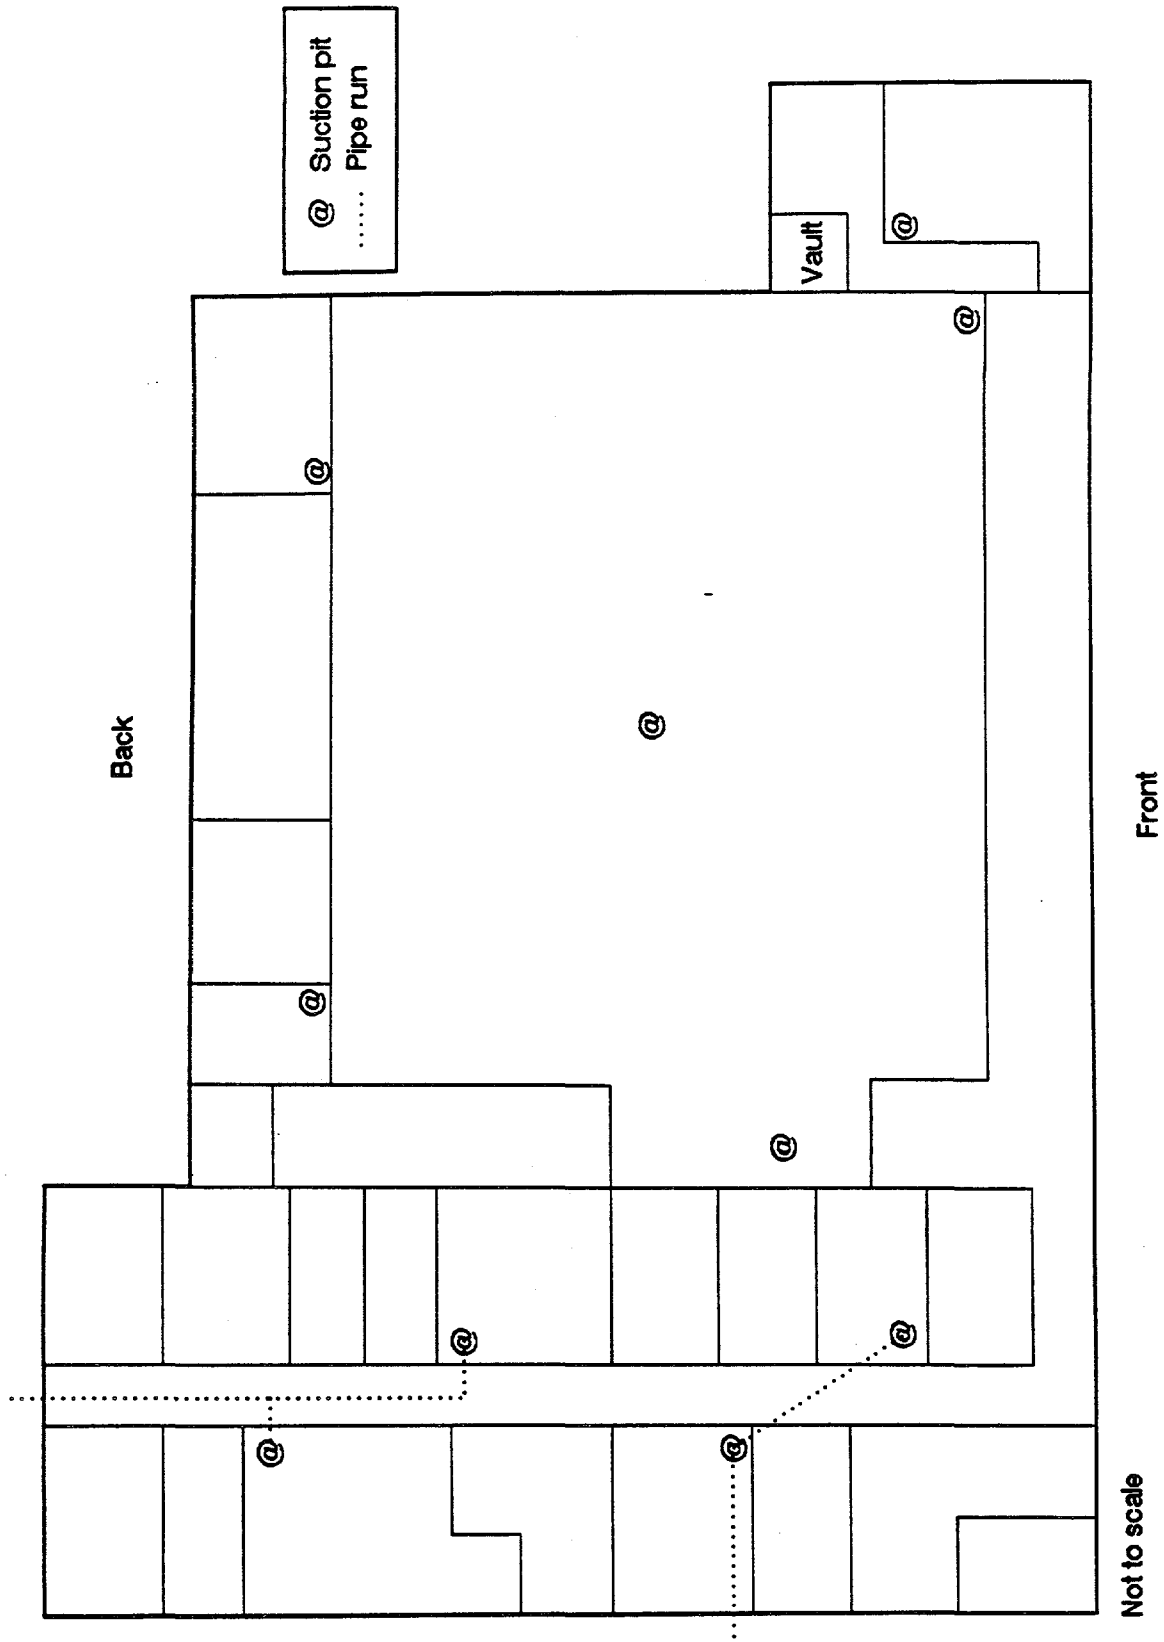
Subslab mitigation plan for the U.S. Post Office in Waynesville, North Carolina.
